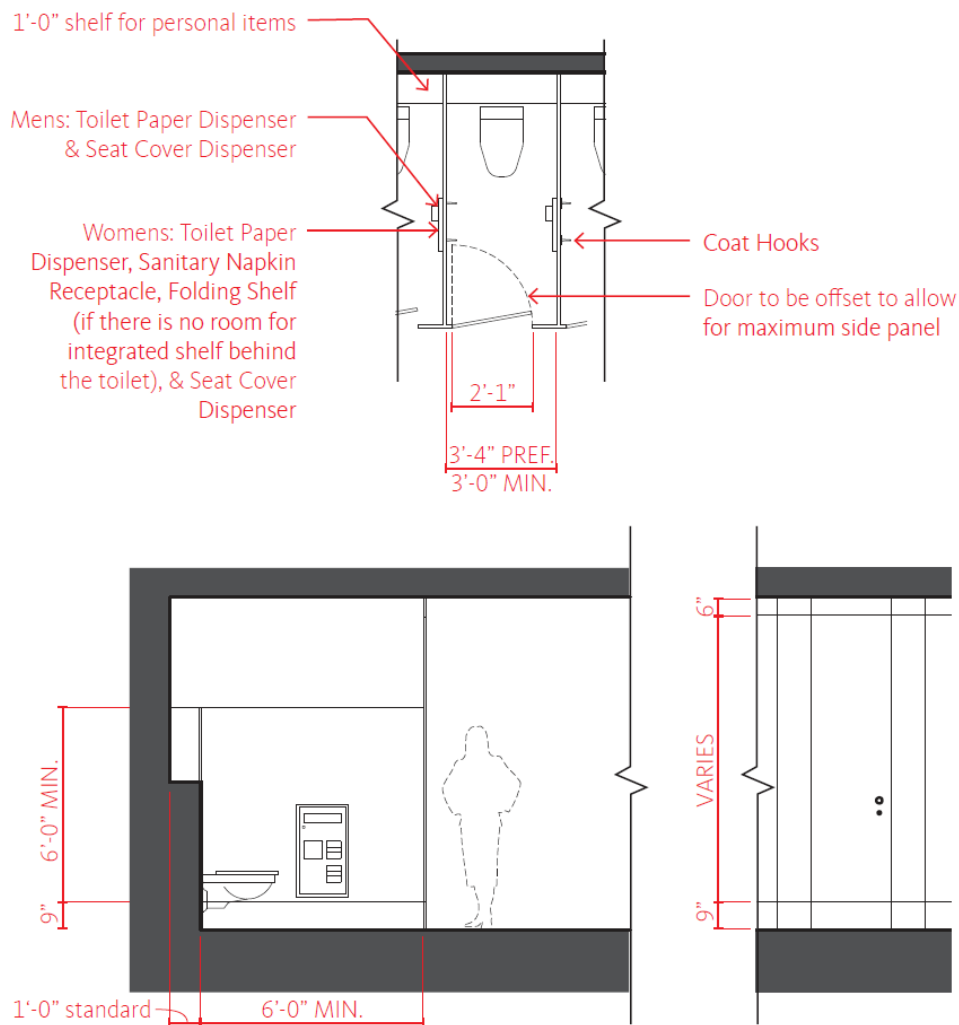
Toilet Compartment Plan, Elevation, and Section
